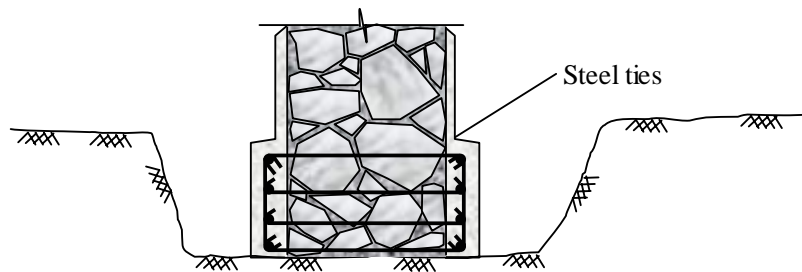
Strengthening of rubble masonry foundation by reinforcement
